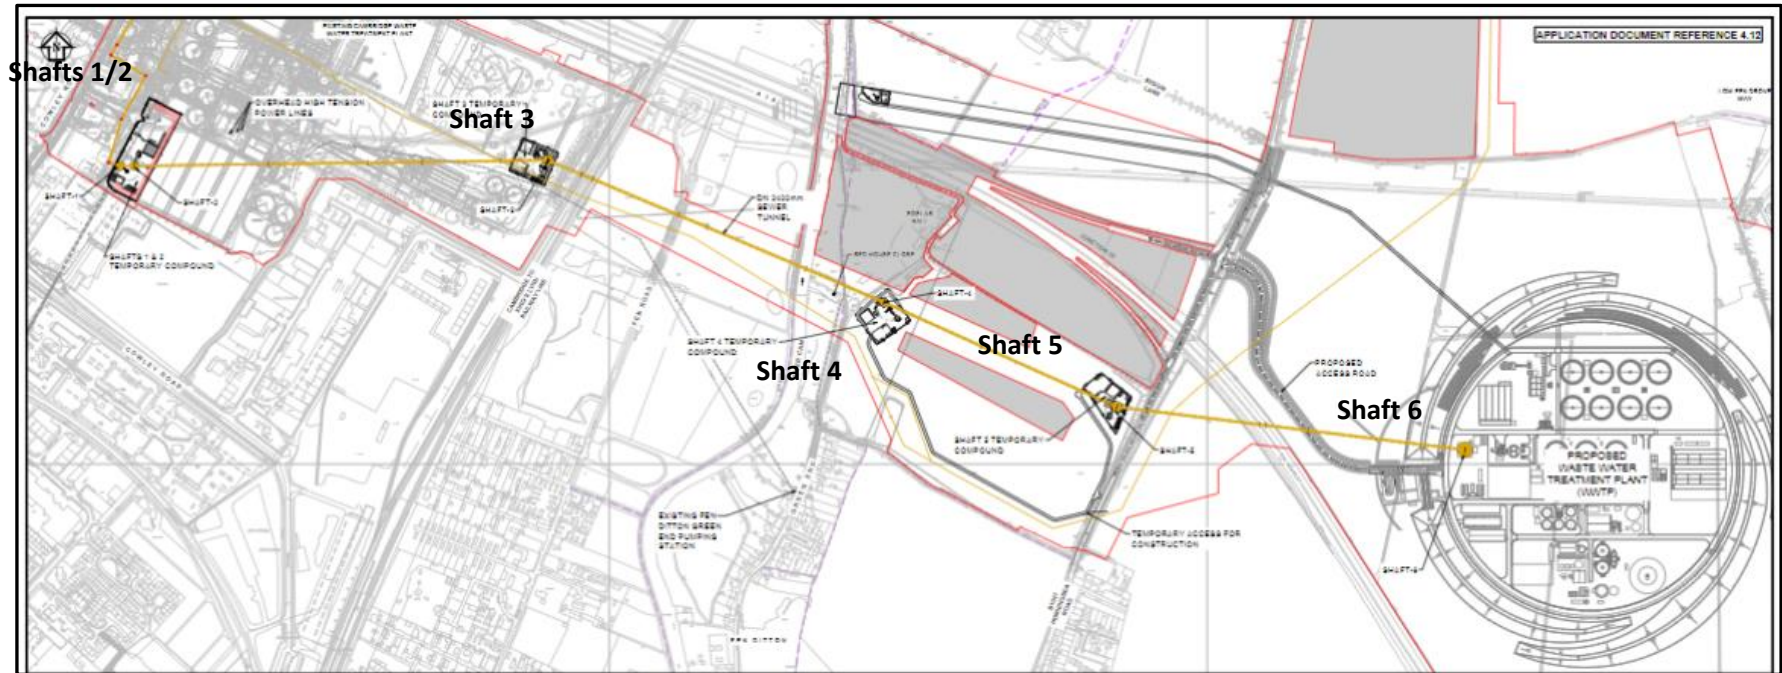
Plan showing the proposed locations of the Waste Water Transfer Tunnel shafts Source: The Applicant. Design Plans – Waste Water Transfer Tunnel & Longitudinal Section (App Doc Ref 4.12) [\[APP-026\]](#).
